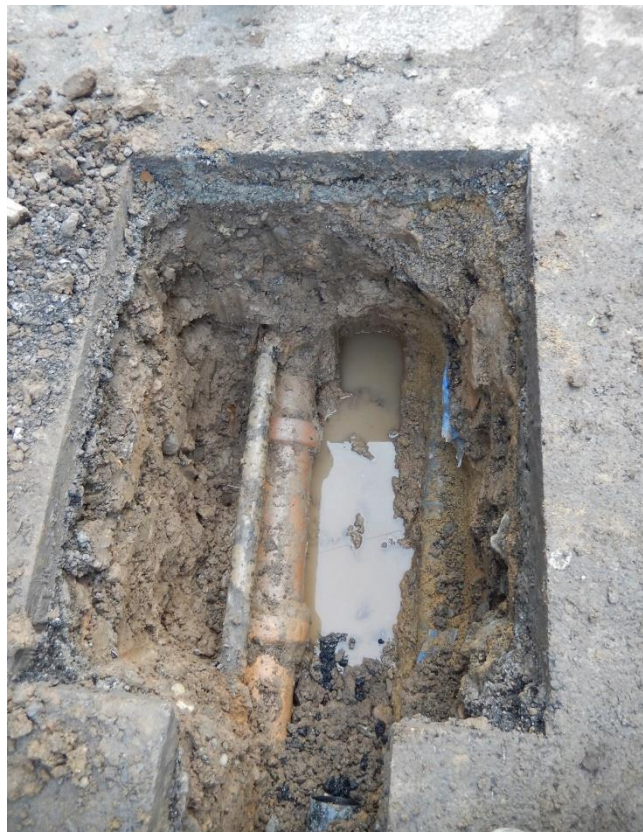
Trench 1 after excavation, between the south and central joint-holes, from north.
